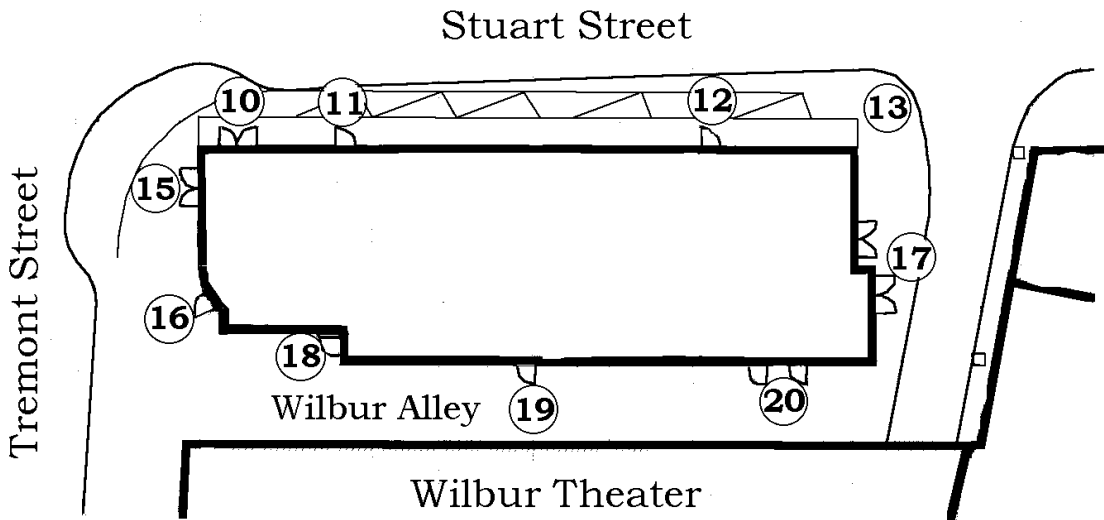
First Floor of PNF (2006) Building Indicating Doors and Pedestrian Level Wind Study Locations
